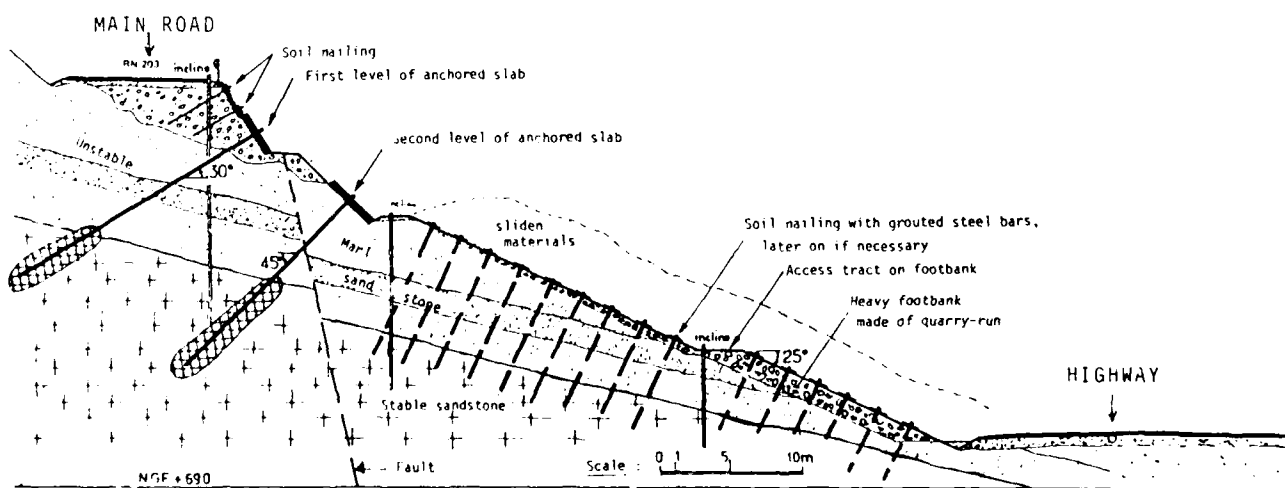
"Les Damets" soil profile with design slope nailing and anchored slabs
